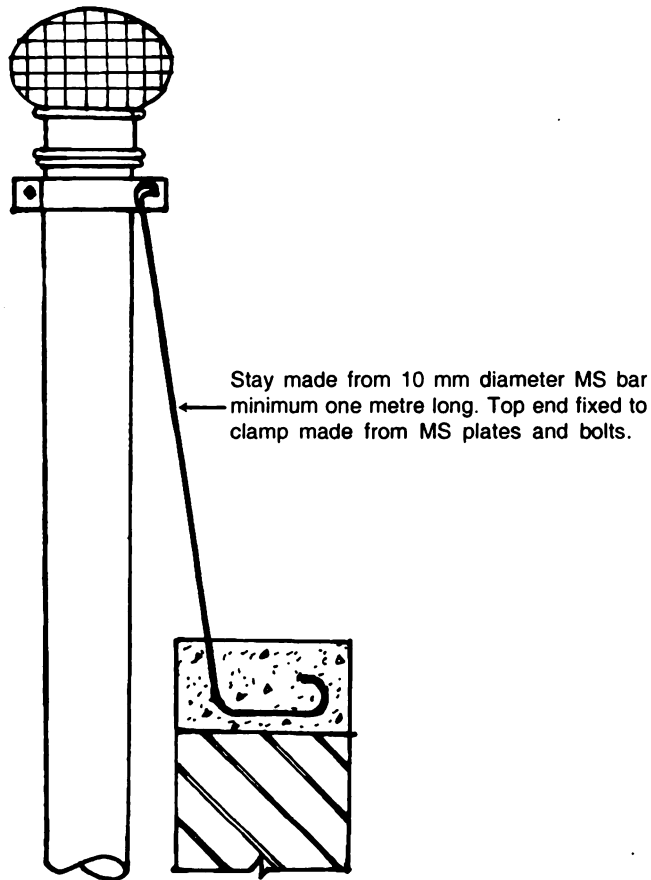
Fixing stack pipe with mosquito proof wire mesh cage to top of parapet wall using 100 × 100 mm size 1 : 2 : 4 concrete block.
